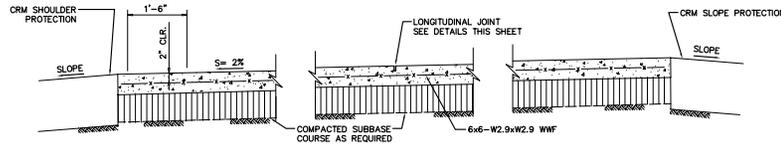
A Culvert Plan & Section Views 2010-04-02.cdr
